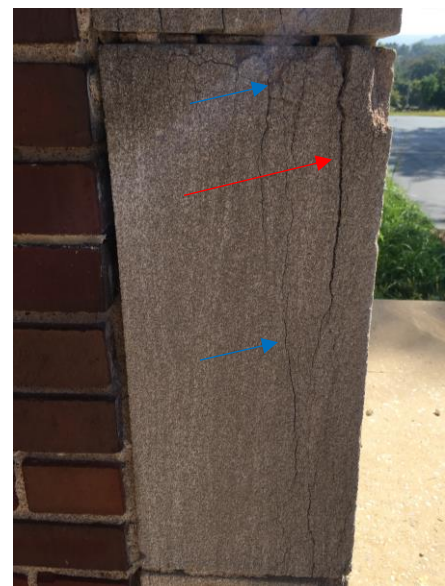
East Side of the Entrance showing the cracks in the limestone blocks on the stone pier. The red arrow indicates that the larger cracks will be injected and the blue arrow shows smaller hairline cracks and fissures.
